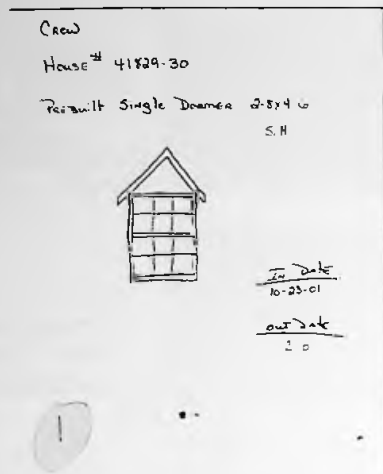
Component plant manager cut sheet, filtered from four sheets of drawings
